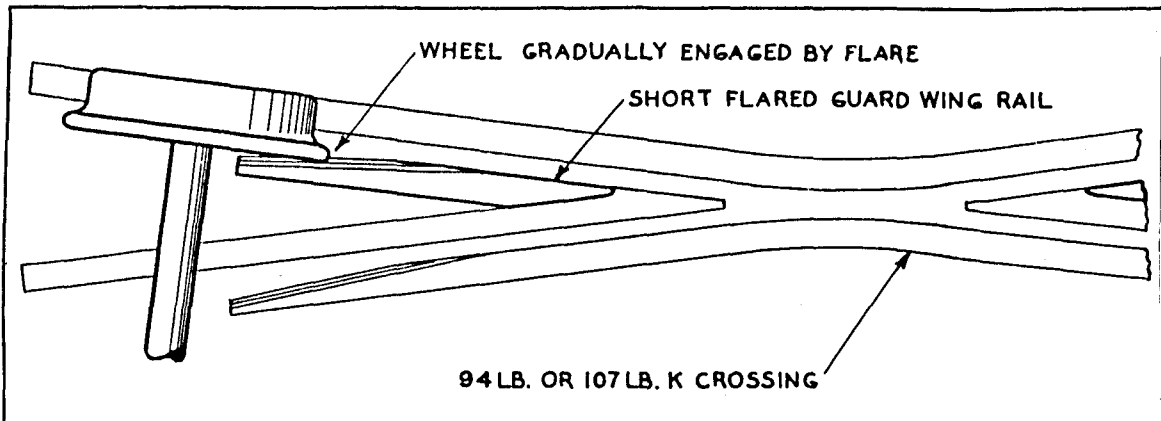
WHEEL SHOWN ENGAGING FLARED GUARD WING
